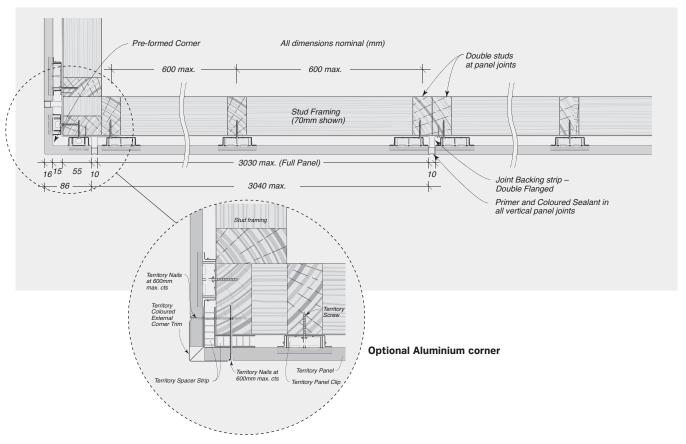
Typical Territory System Cross Section for Timber Framing - Elevation
